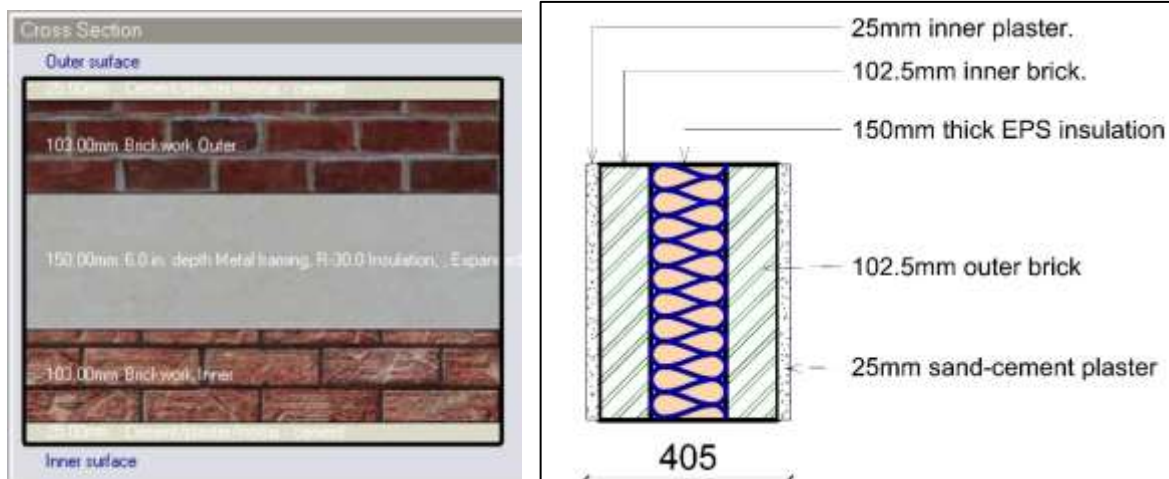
Cross-Section of the Improved Wall System (Authors Sketch; Design Builder).
